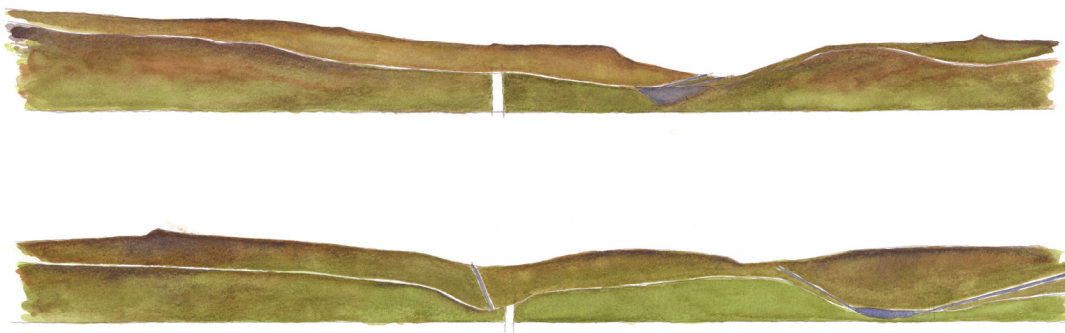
Section through site towards the west; Fig. 4.58 Section through site towards the south
